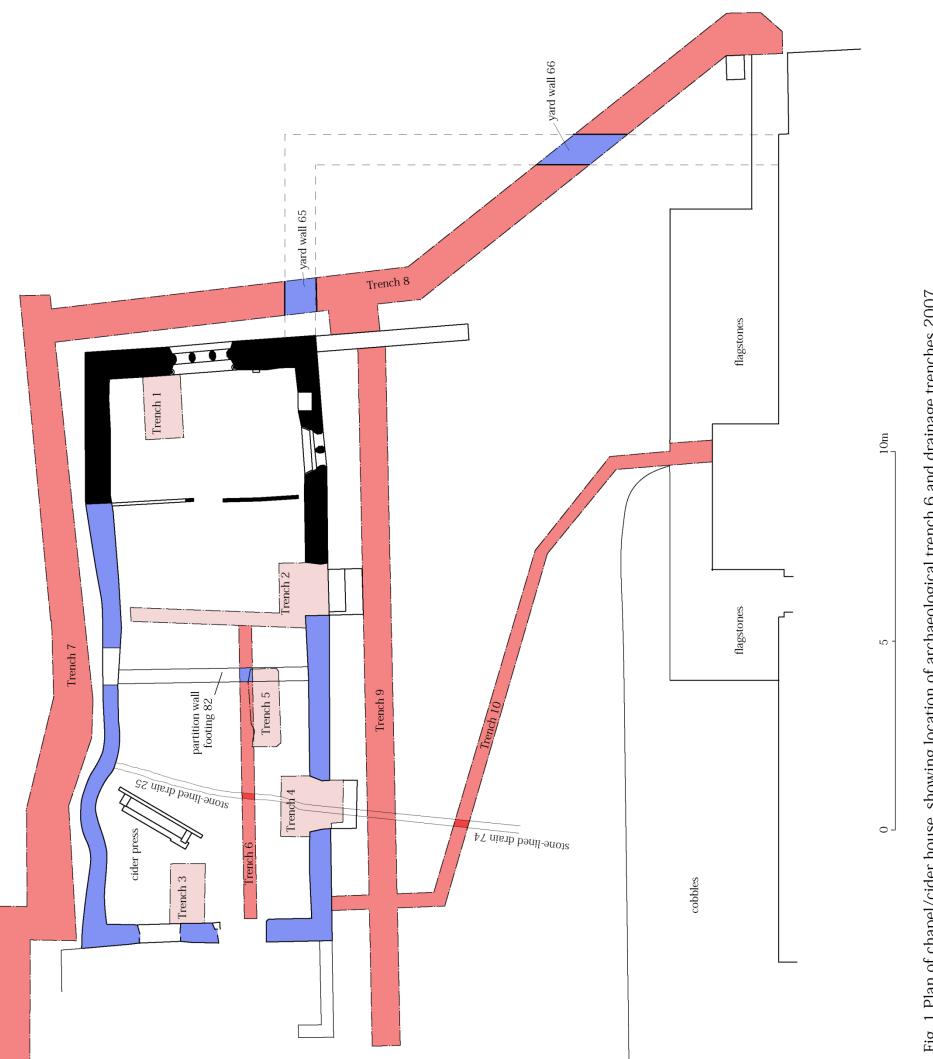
Plan of chapel/cider house, showing location of archaeological trench 6 and drainage trenches 2007 (plan after Anthony Brookes Surveys March 2006)
